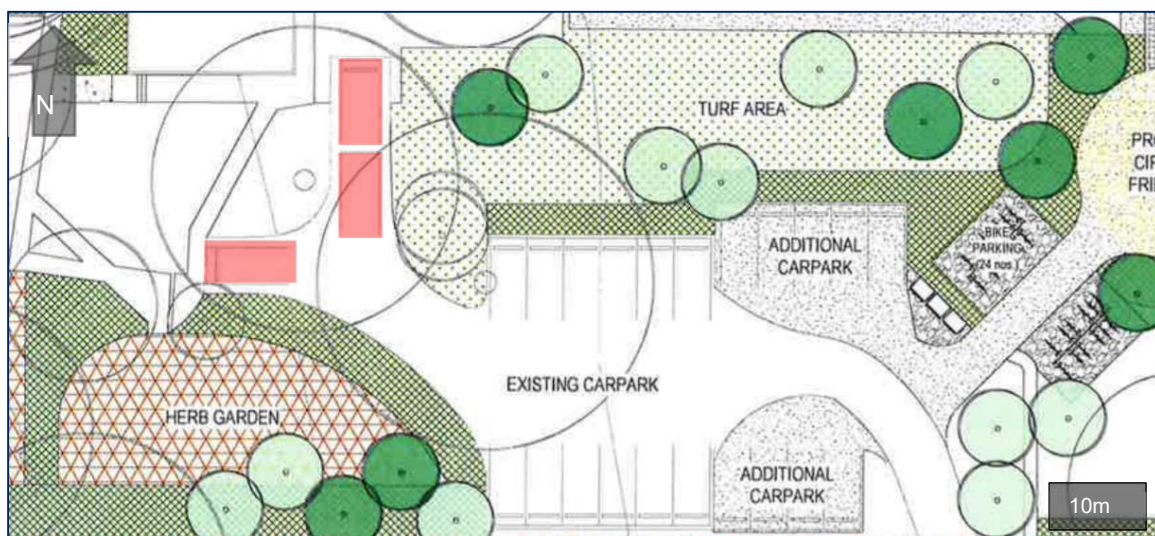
| Approved car parking layout (Source: Department's original consent 2019)
